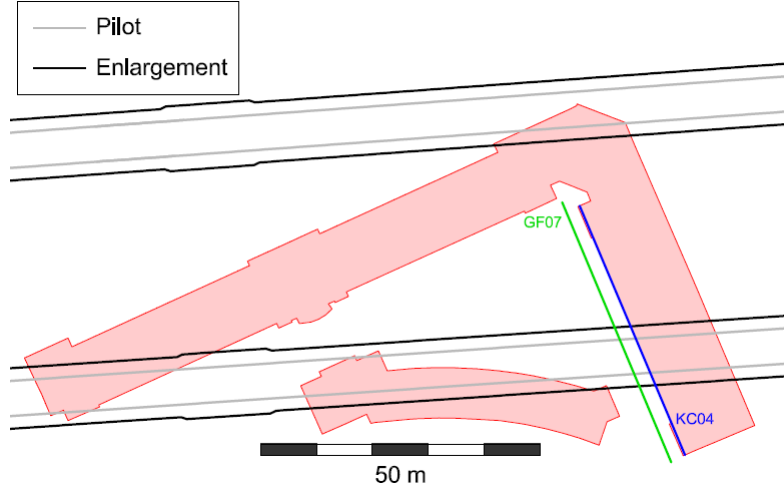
Layout of piled building KC in relation to station tunnels on Crossrail projects, Mair and Williamson [2014]
